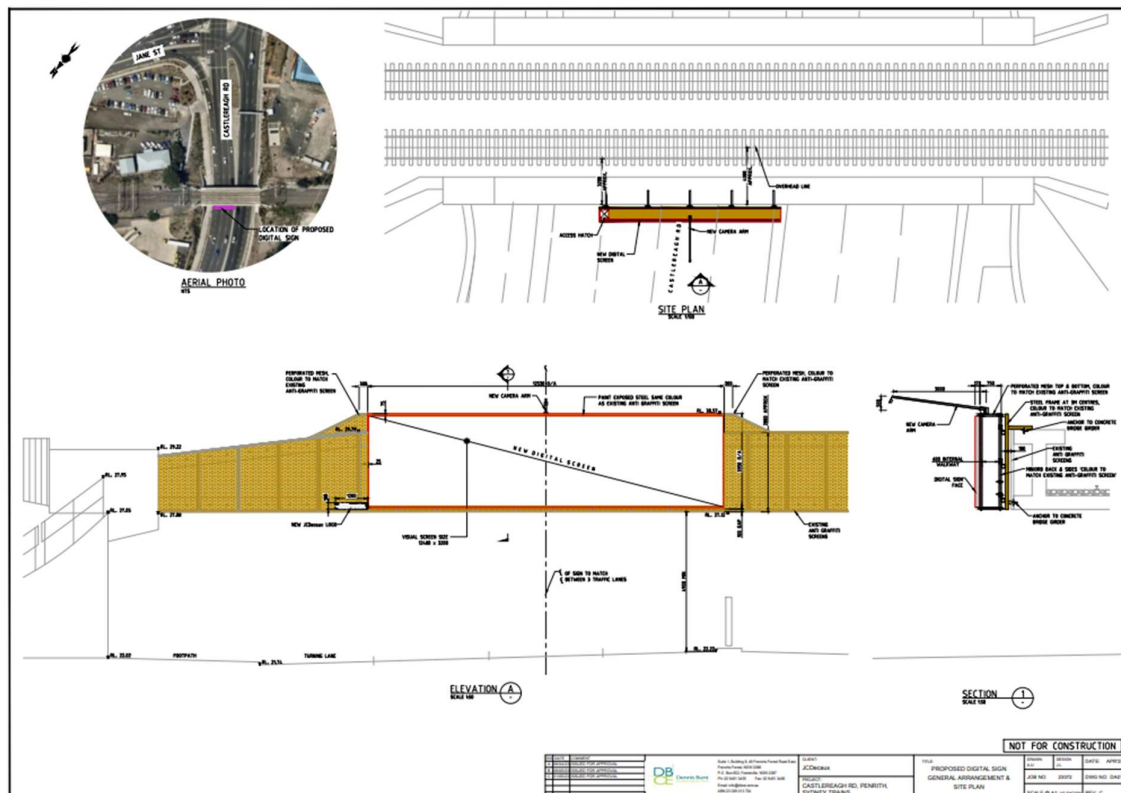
Proposed digital screen details. (Dennis Blunt Consulting Engineer 2023)
